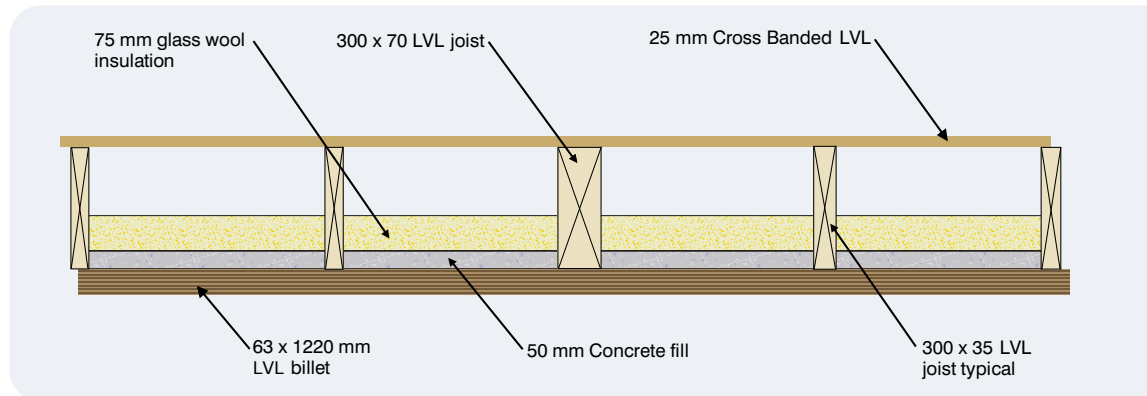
Section through LVL double skin cassette with concrete and insulation.
